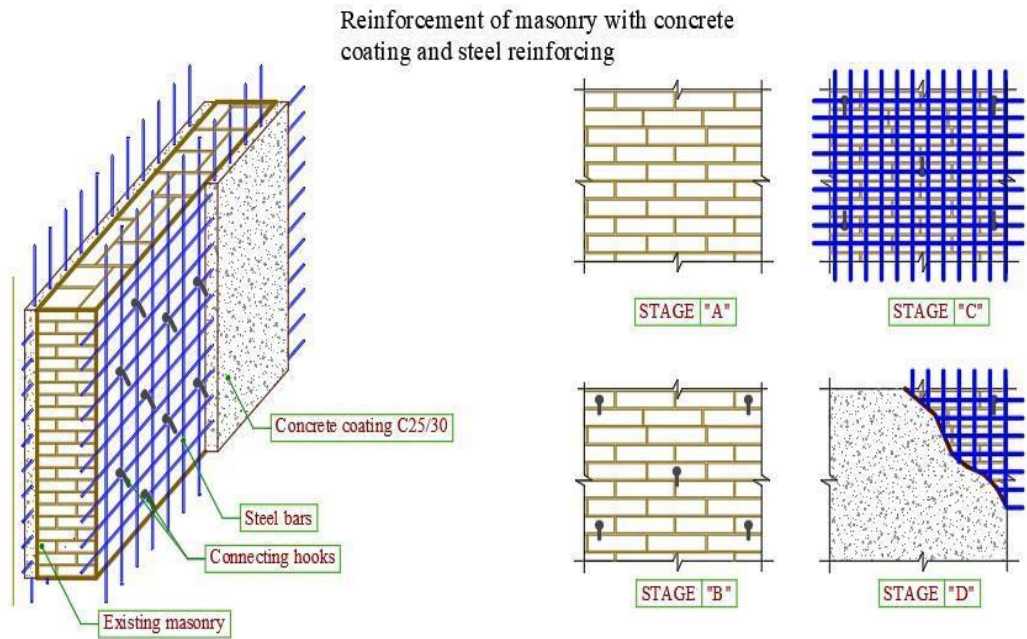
Reinforcement of masonry with concrete coating and steel reinforcing
